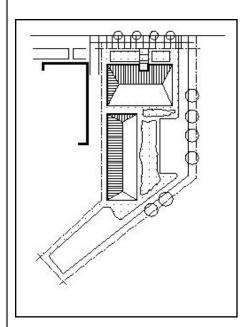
Preferred: Site plan of preferred configuration for new mixed-use residential development enabled by TOD zoning. Except for the narrow driveway, the building frontage maintains the definition of the street.
